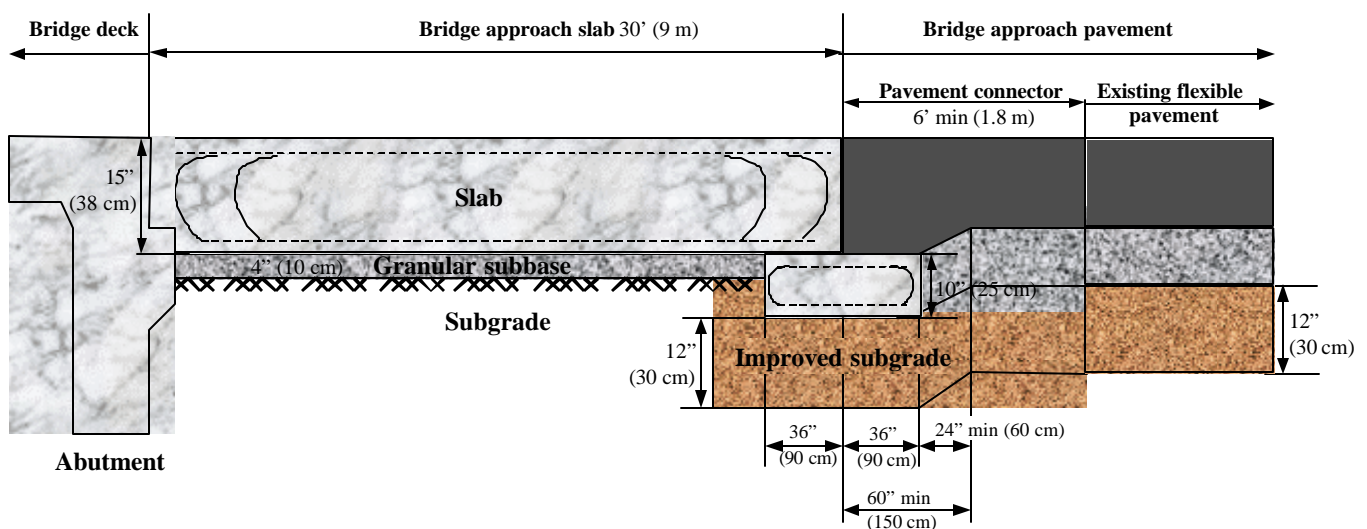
Typical IDOT design of a bridge approach slab connecting the bridge with asphalt pavement
